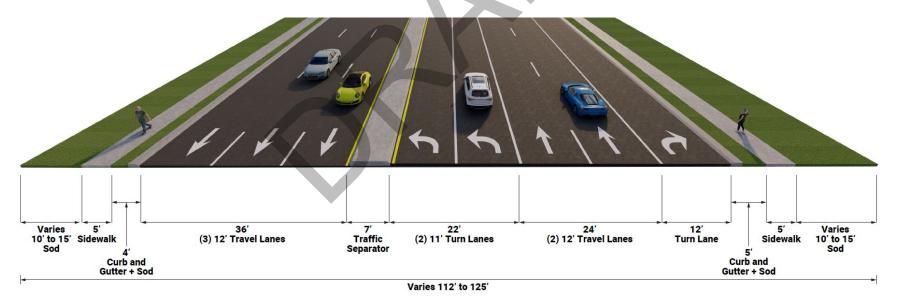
Bonita Beach Road – Existing Cross Section at Sta. 275+00
